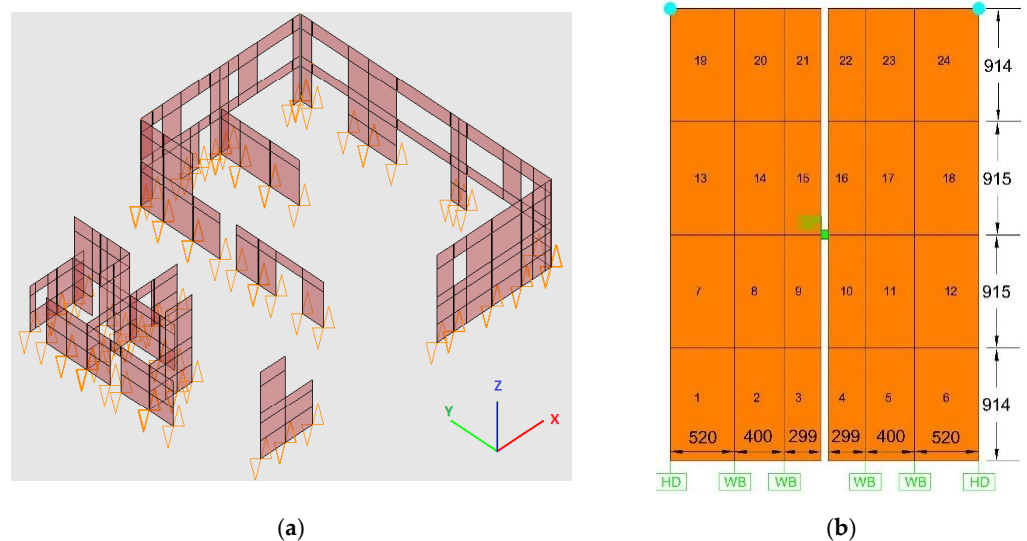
Numerical models: (a) case study building; (b) the balloon shear wall (unit: mm).
